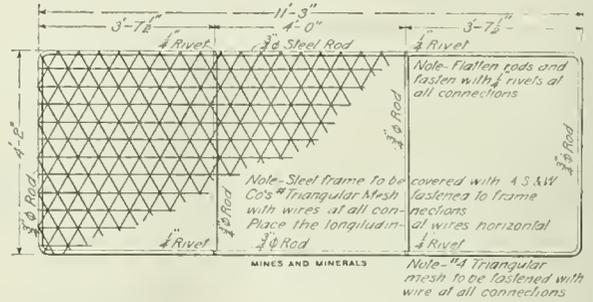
STEEL FRAME SUPPORTING REINFORCEMENT
